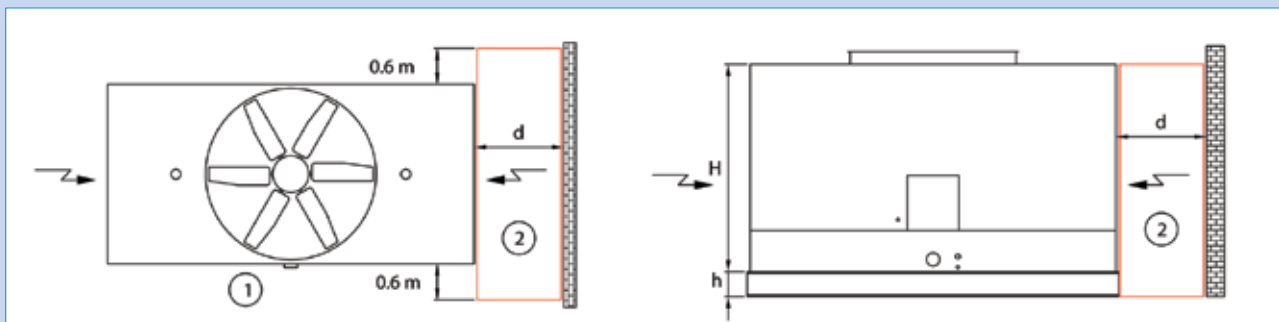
Unit with two Air Inlets adjacent to a Wall
